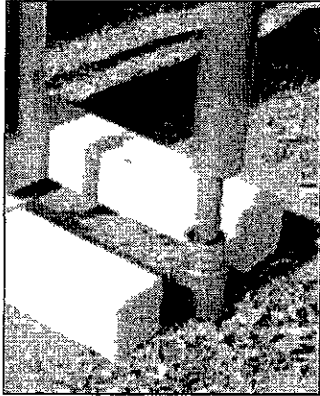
Place a 2.125-inch probe rod over the 1.0-inch rod and thread it onto the outer casing string.
